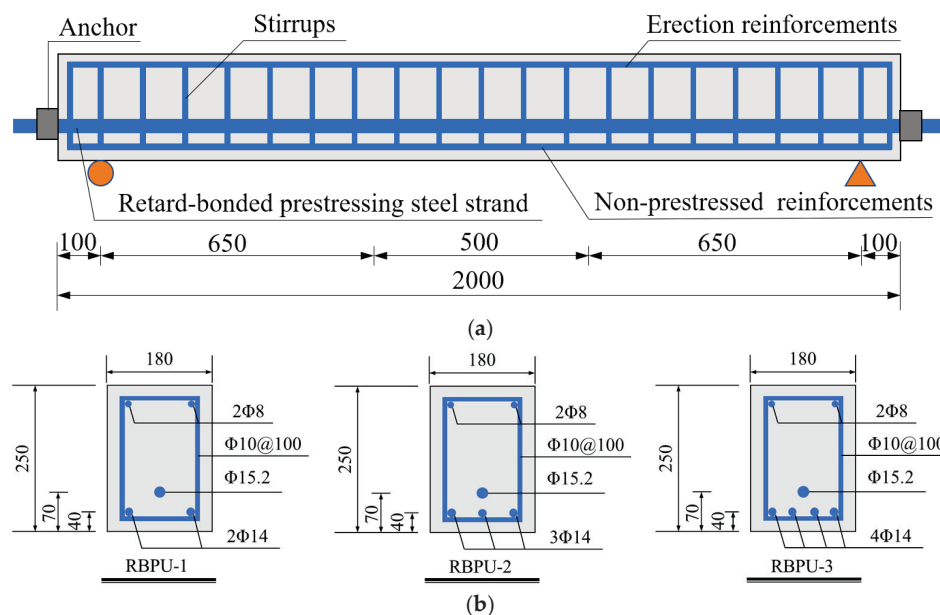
Structural configuration and dimensional parameters of RBPU beam specimens (unit: mm): (a) arrangement of reinforcements and prestressing strands; (b) cross-section.
